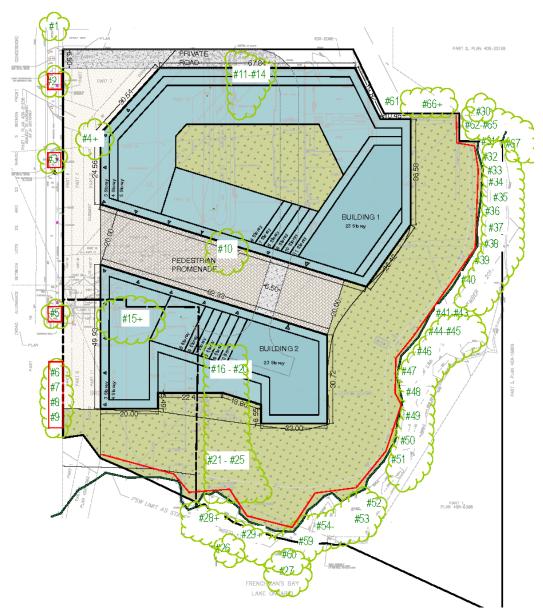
General layout of the Concept Plan of the 591 Liverpool Road property. Trees are numbered (green), and tree protection barriers and sediment control fences (red) are indicated. See Pickering Harbour Concept Plan (Jan 14, 2019) for more details.
